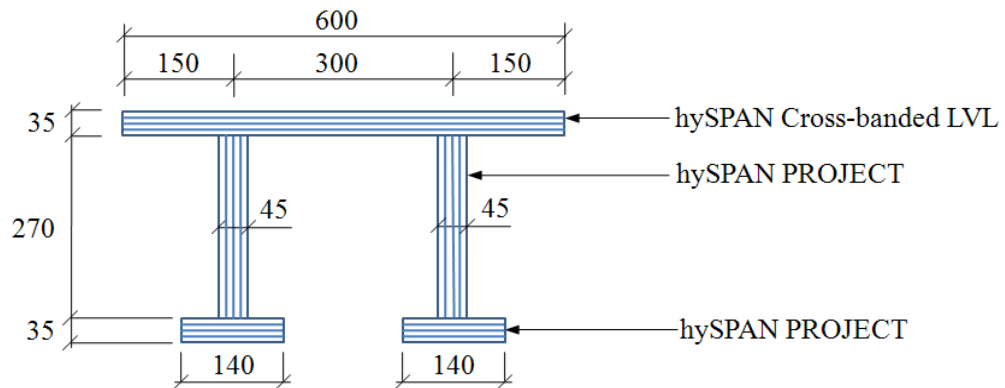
Dimensions of the 8 m span timber beams (mm).
